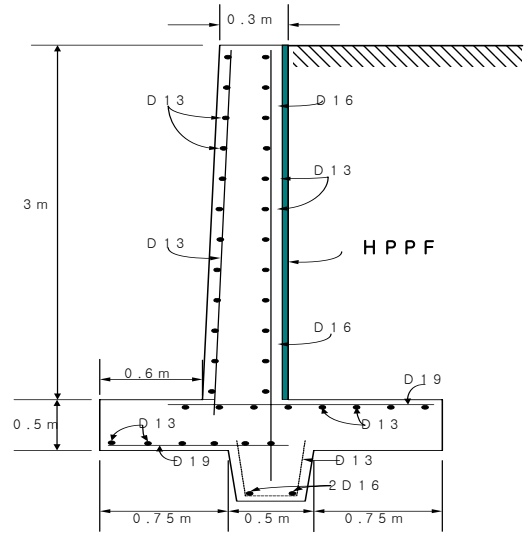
Typical Retaining wall structure with HPPF adopting section
